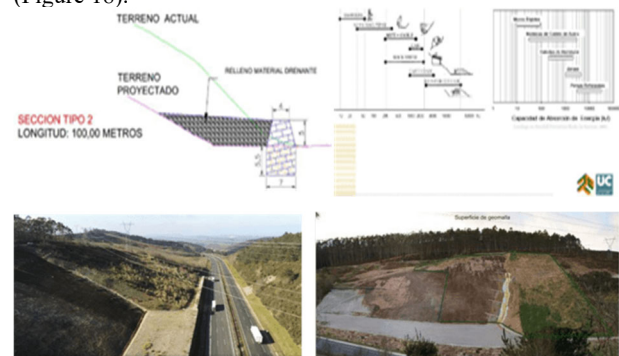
N-629 PK 81+800 MD. Slope detachment. Construction of a breakwater wall
